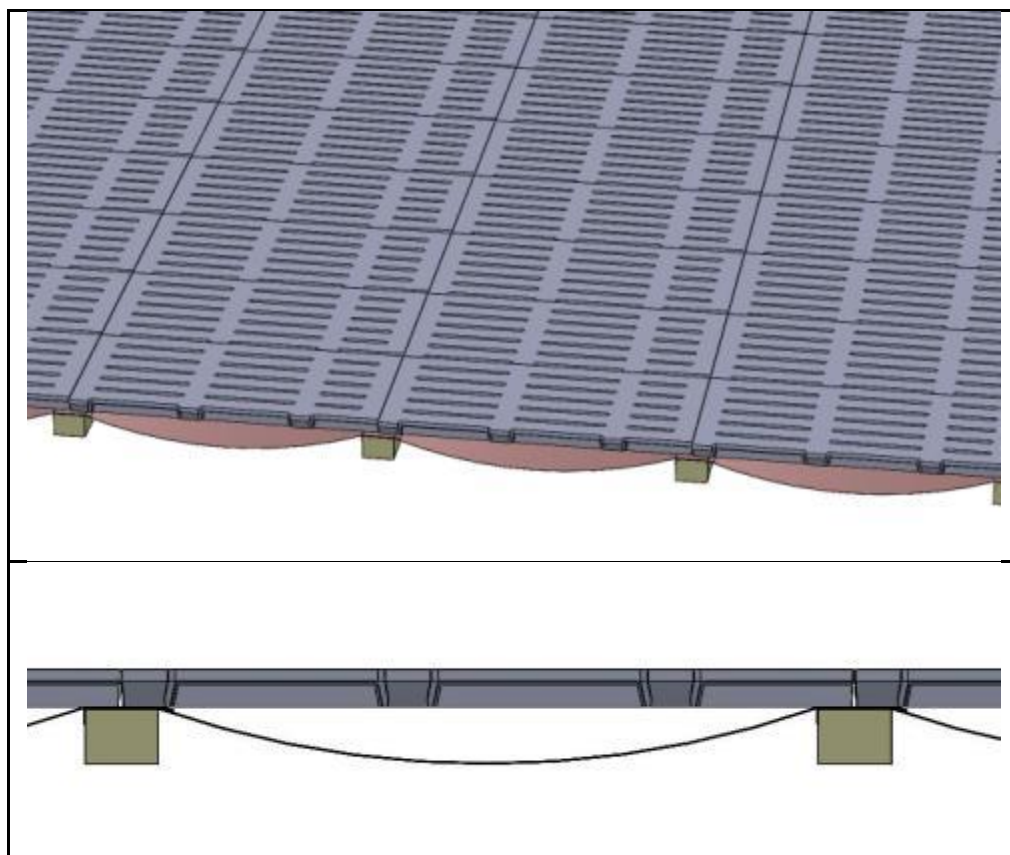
The envisaged layout of the slatted area with water proof under slat manure collection area from above and from the side-view
